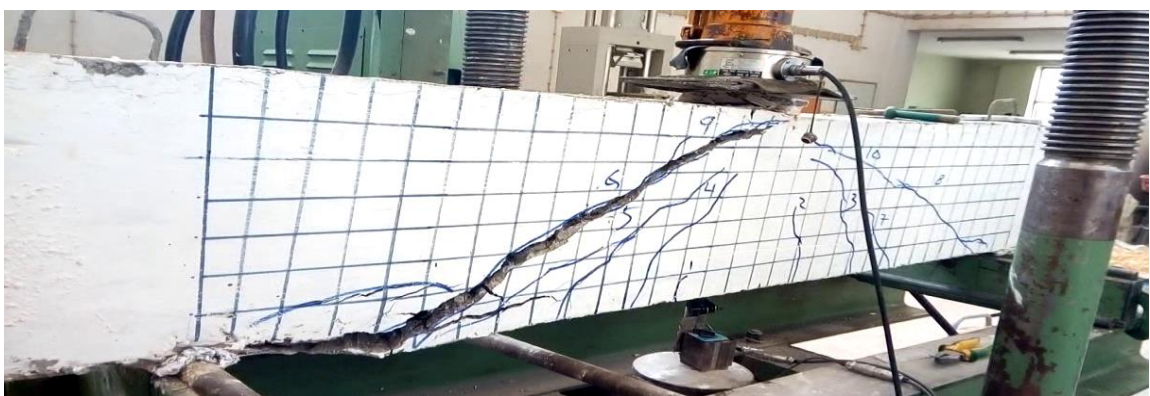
Specimen BS36 beam with shear reinforcement after failure
